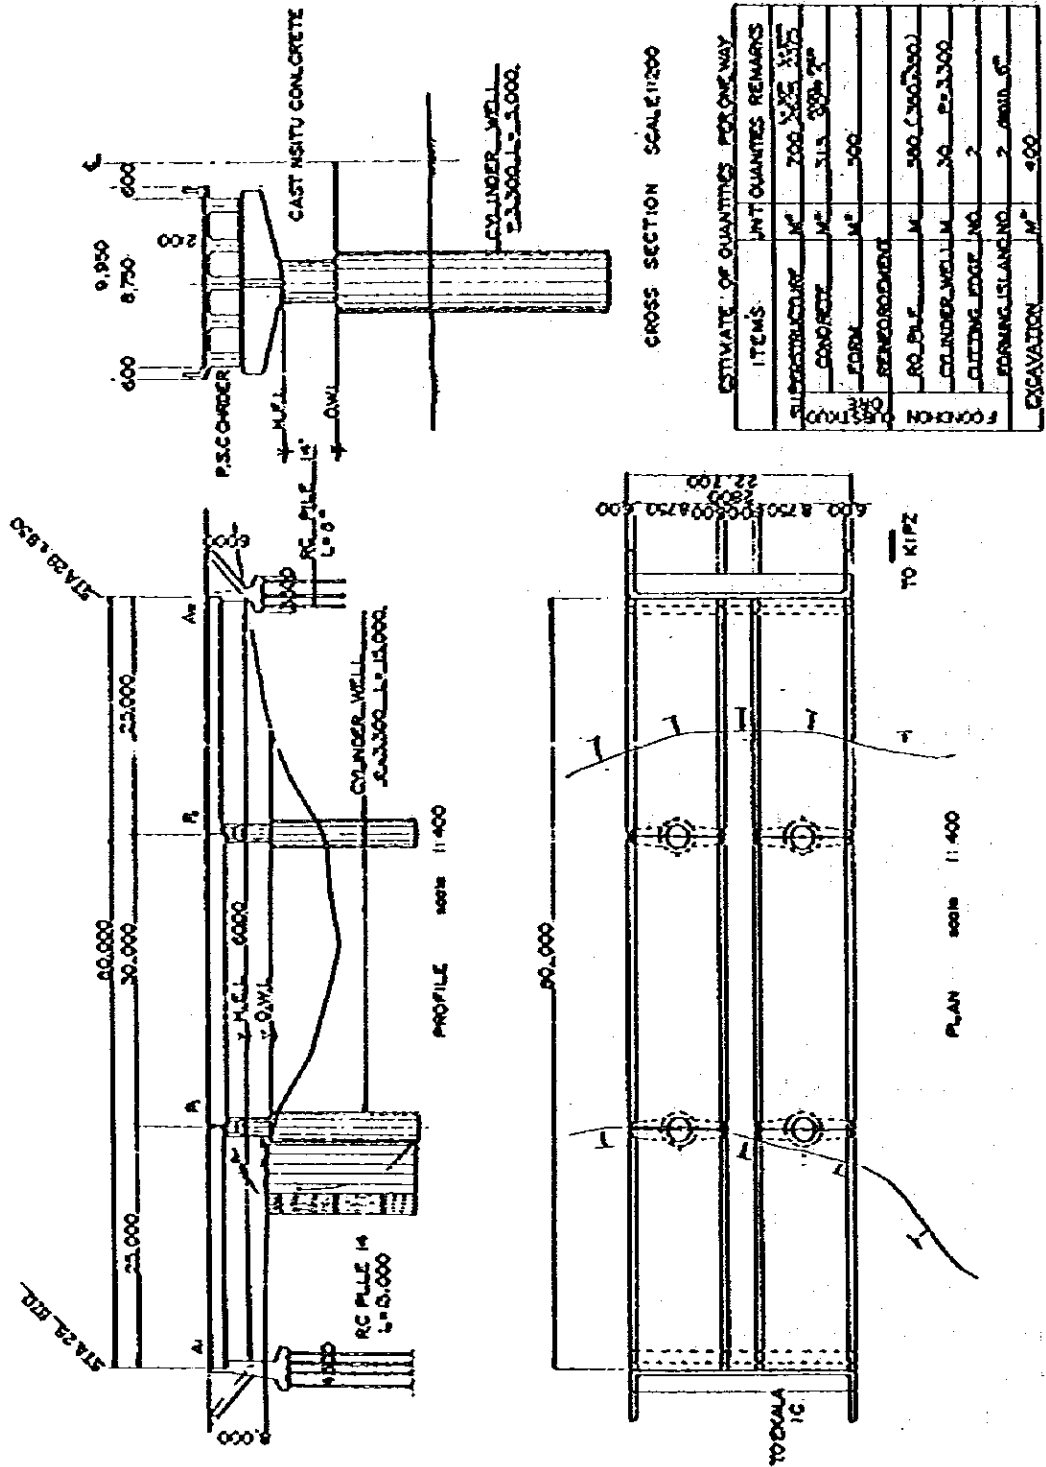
General Plan (Dandugam Oya Bridge)
